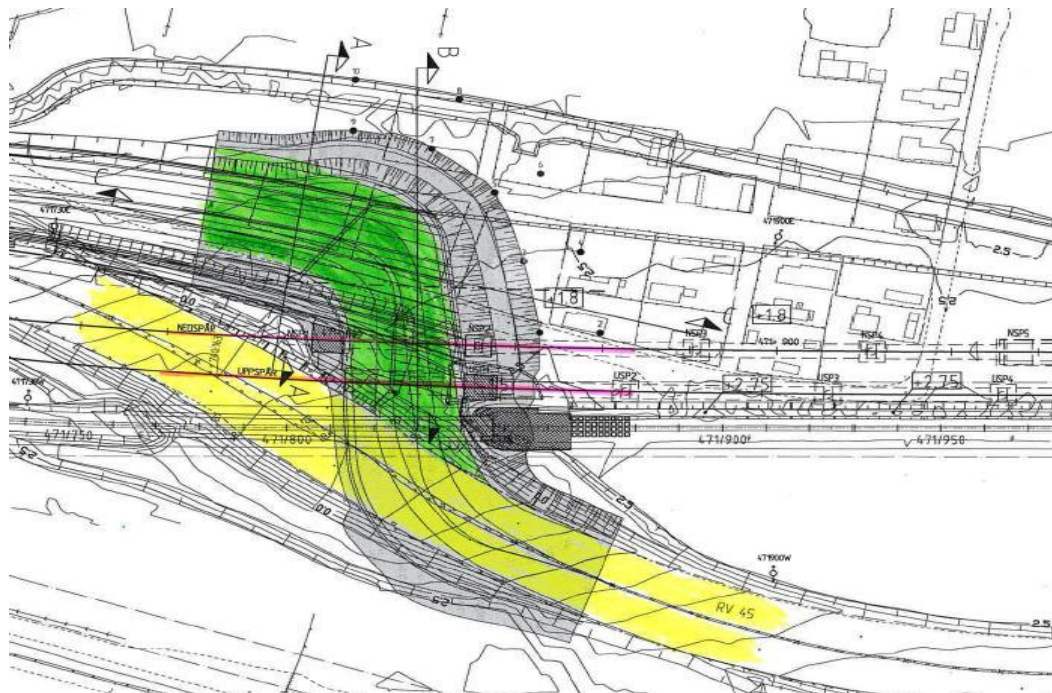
Detail section of E13, which consists of the existing highway marked in yellow, the two railway bridges, USP and NSP, marked in red, and the excavation area marked in green.
